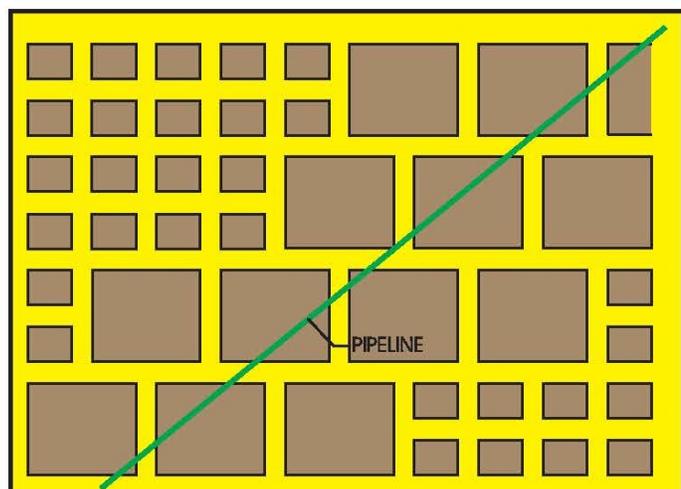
FINAL LAYOUT OF PILLAR SUPPORT USED BENEATH THE PIPELINE
